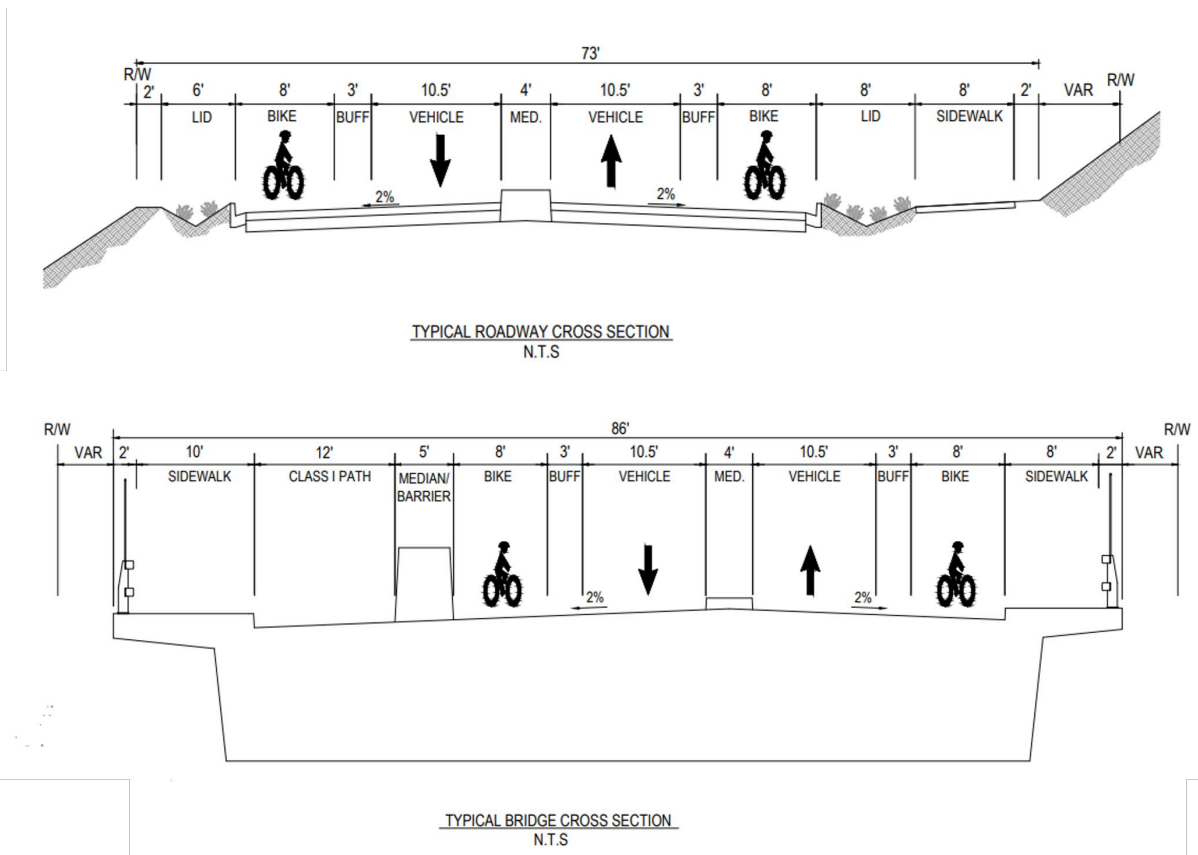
Typical Roadway (above) and Bridge (below) Cross Sections
